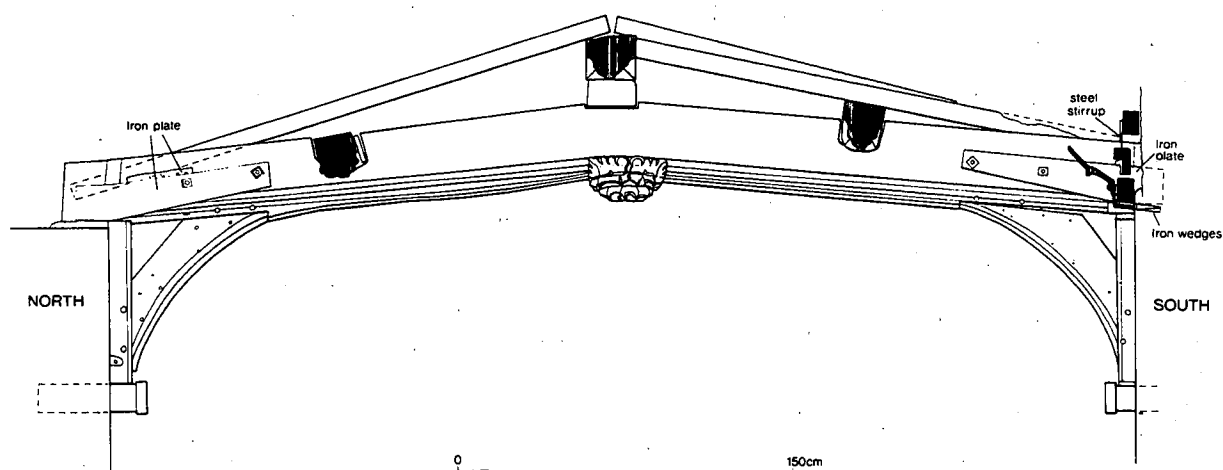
St Nicholas' Church, Stanford on Avon: elevation of tie-beam assembly, truss 4.
